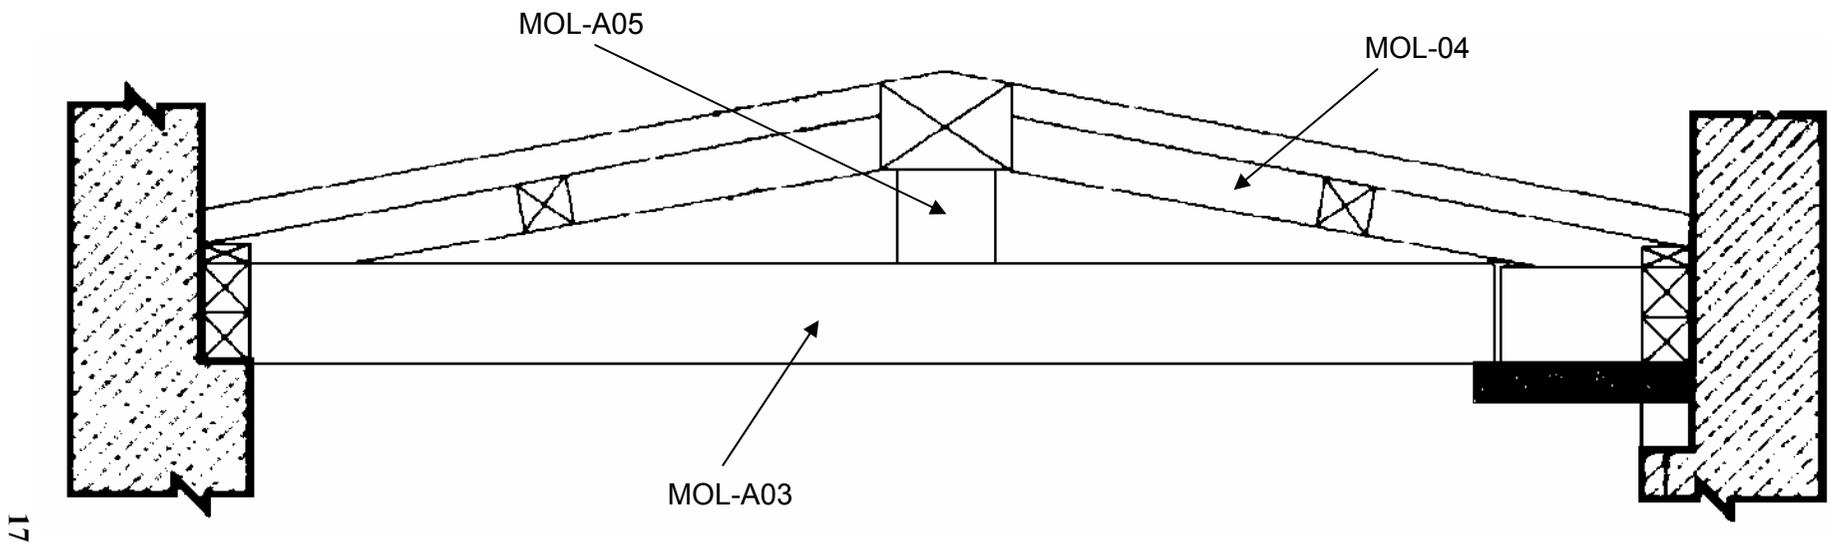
Roof truss, mid truss, showing the location of samples MOL-A03–5 (Hockley and Dawson)
